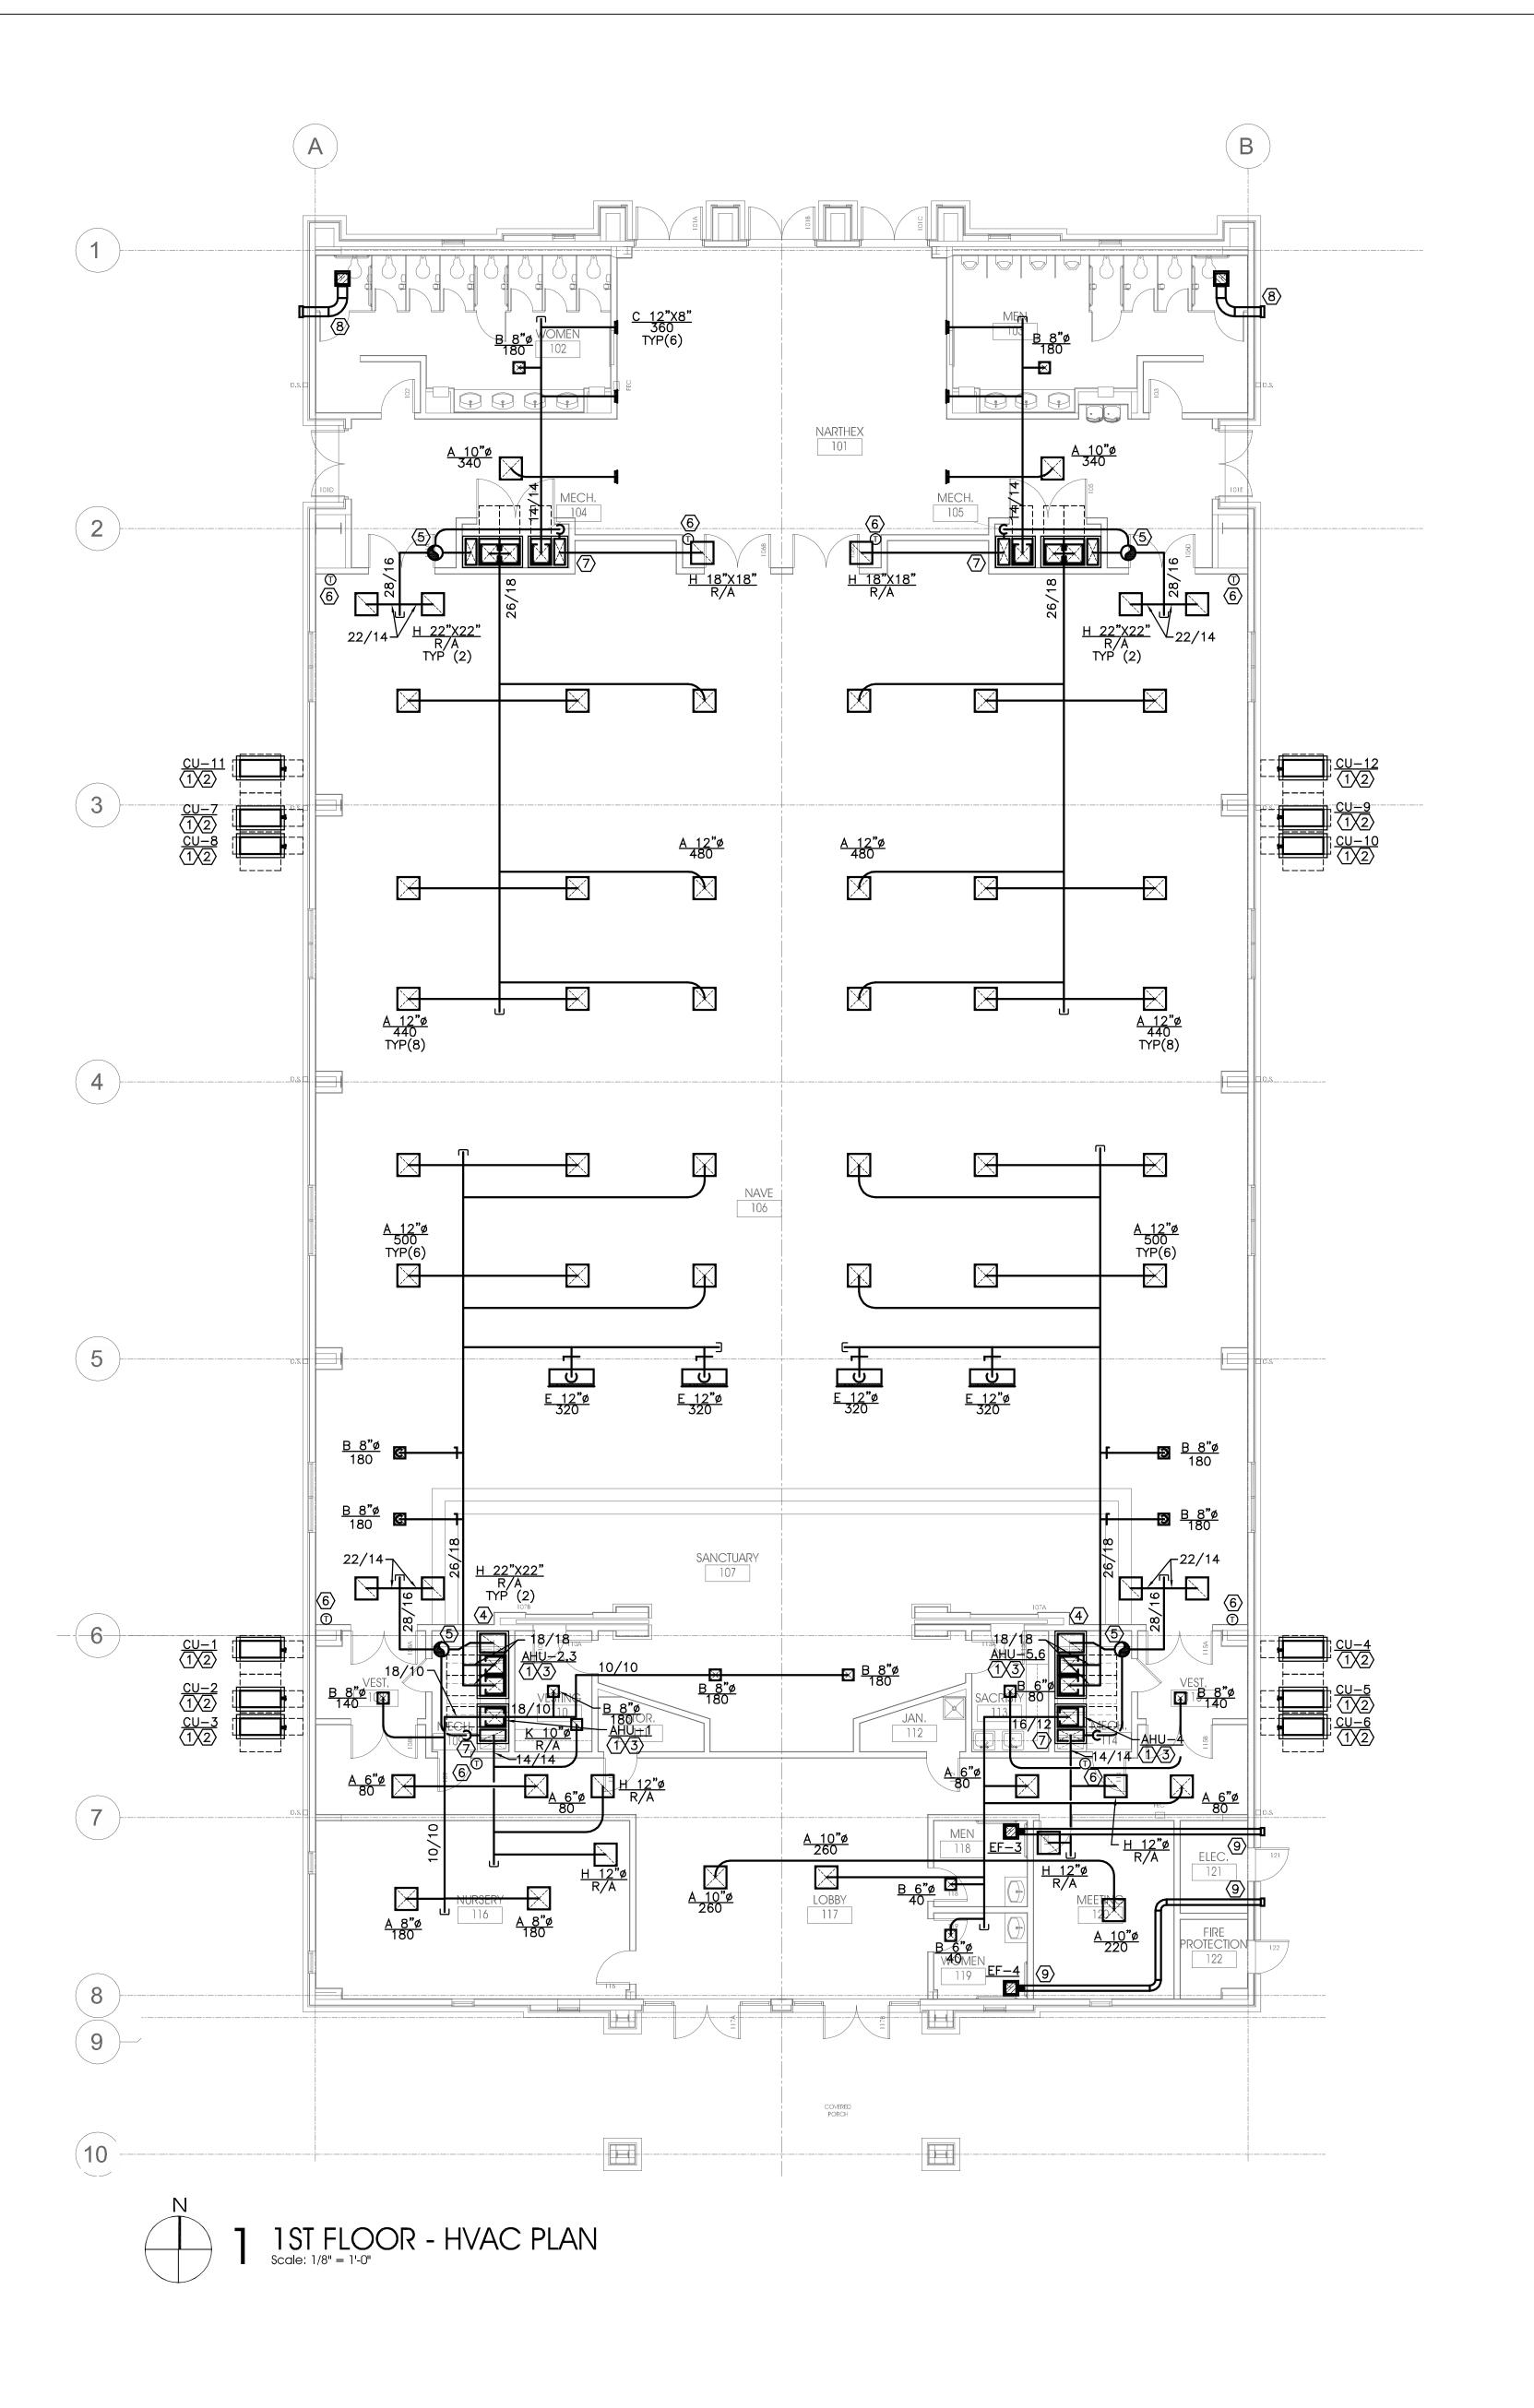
ST FLOOR HVAC ZONING PLAN Project No. 08/05/2024 2403 Sheet No.
